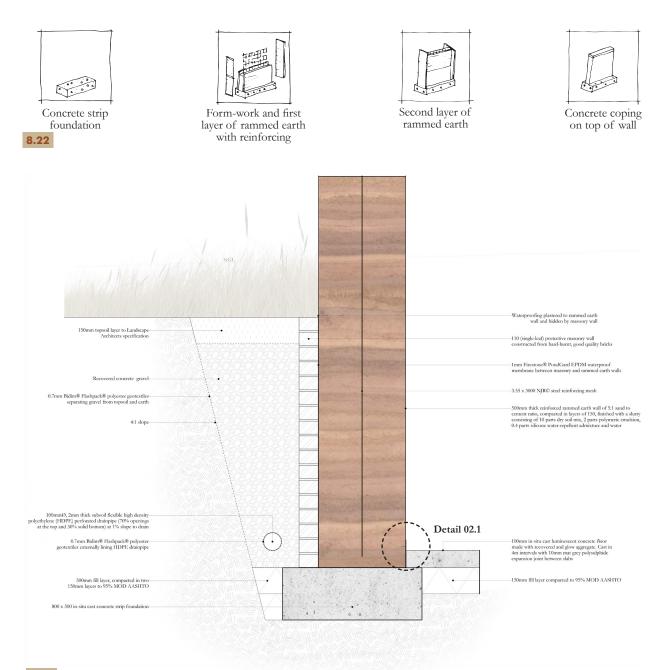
Section through The Settlement indicating detail areas (Author 2019) Fig. 8.21 Detail 01 through recovered rubble retaining wall (Author 2019) Fig. 8.22 Typical
